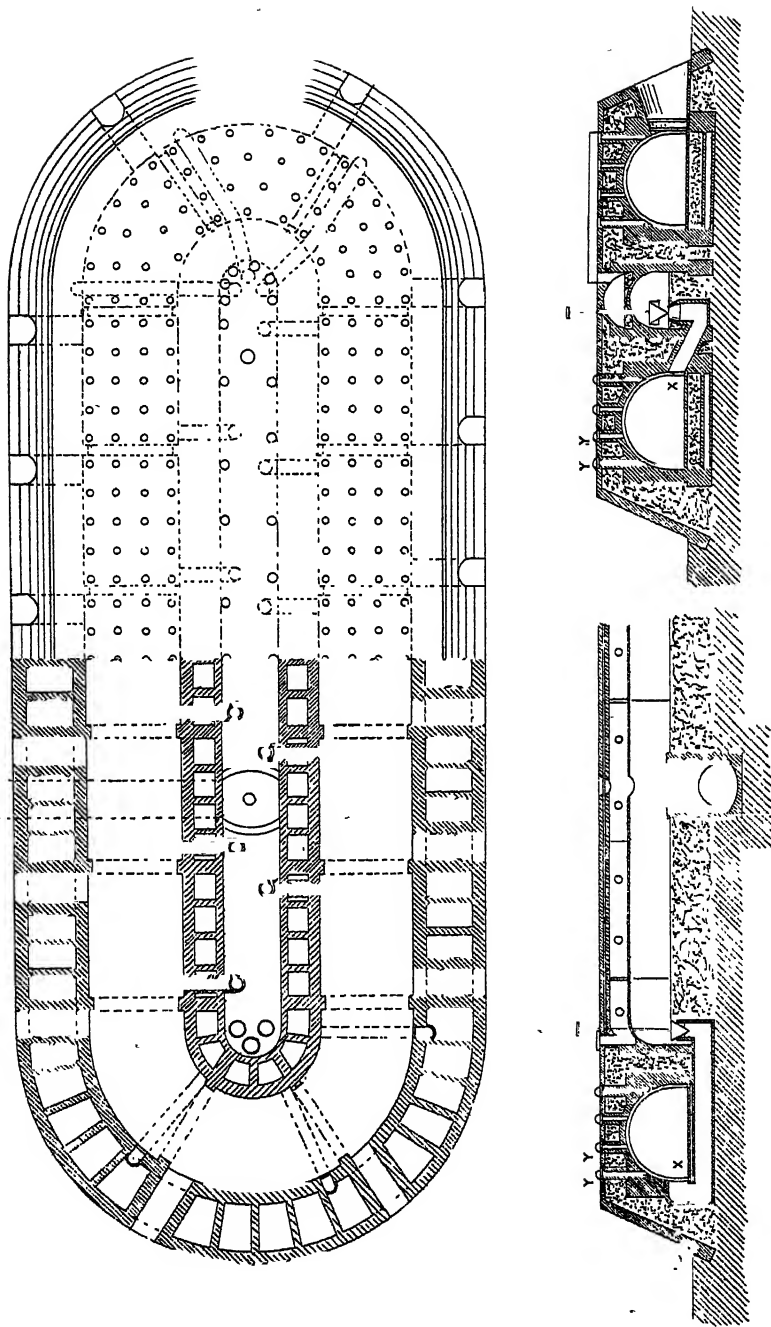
The Hoffmann Kiln—Plan and Sections.
